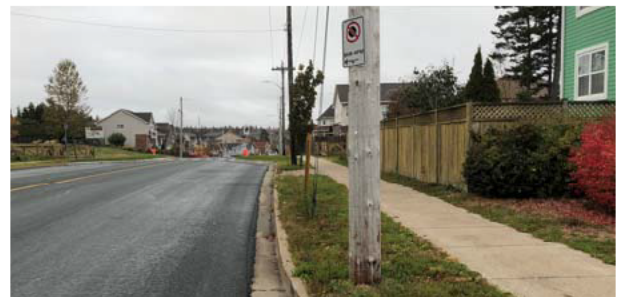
Looking west (to the right) on Langbrae Drive from Roxbury Crescent
